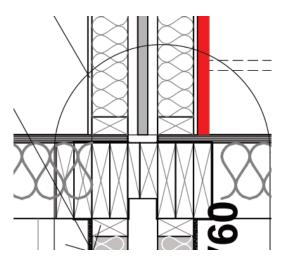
Intertenancy wall with cavity, edge-sealed at floor
